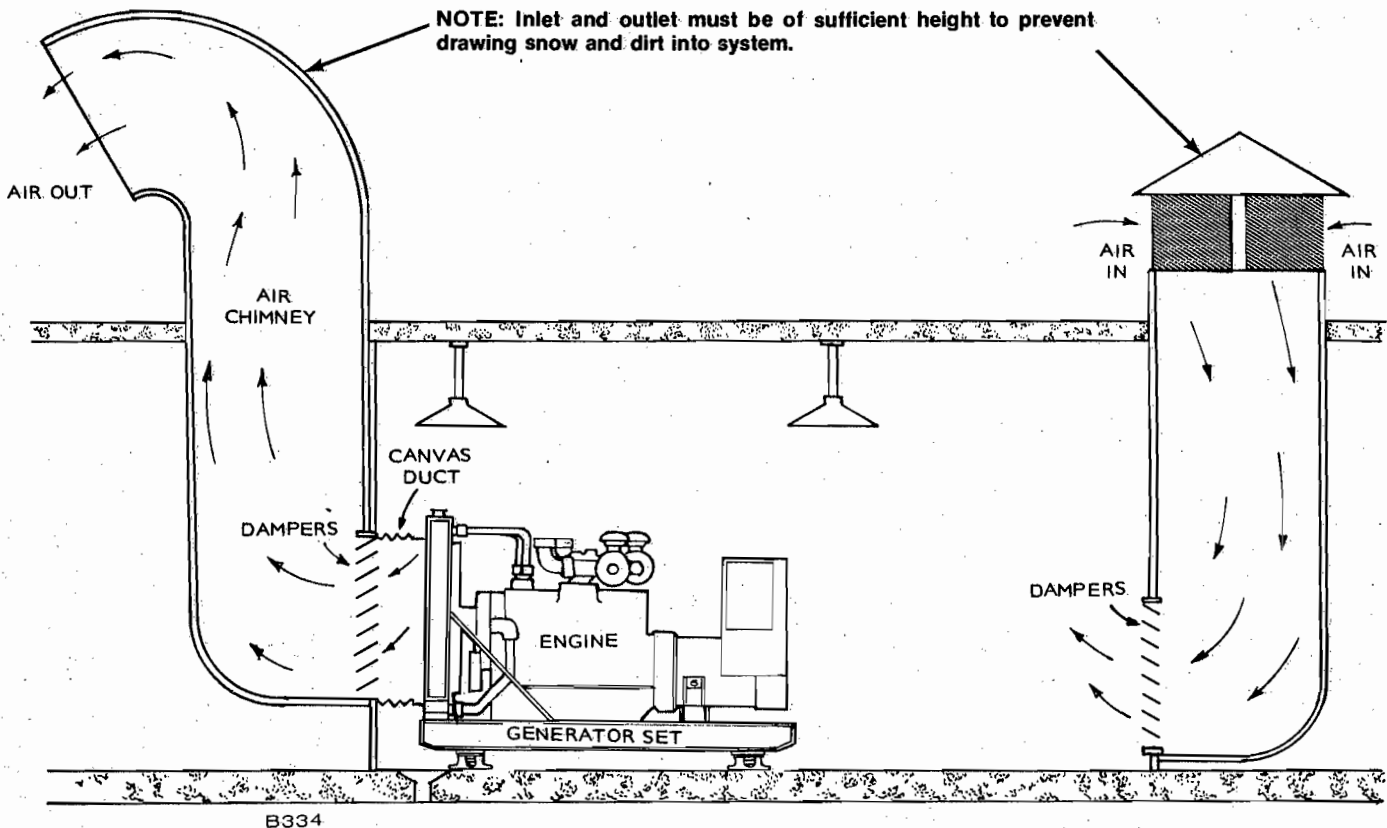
TYPICAL DUCT INSTALLATION WITH ROOFTOP AIR INLET AND OUTLET
